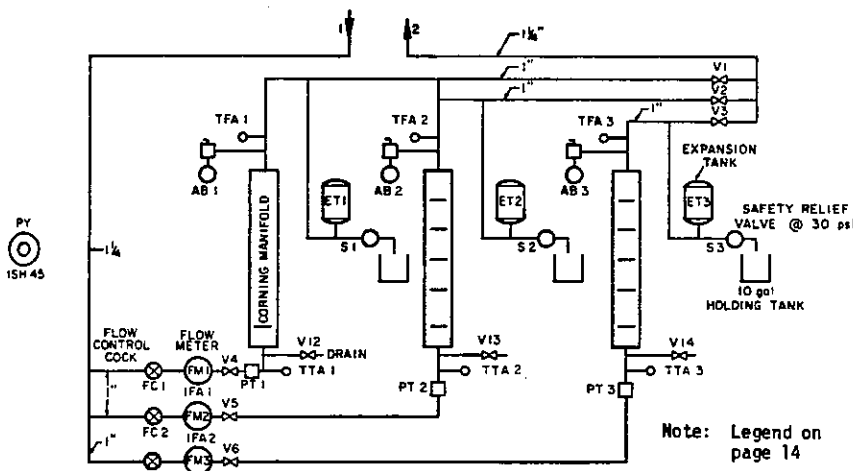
Corning Collector Piping Detail, December 1976 to June 1978
